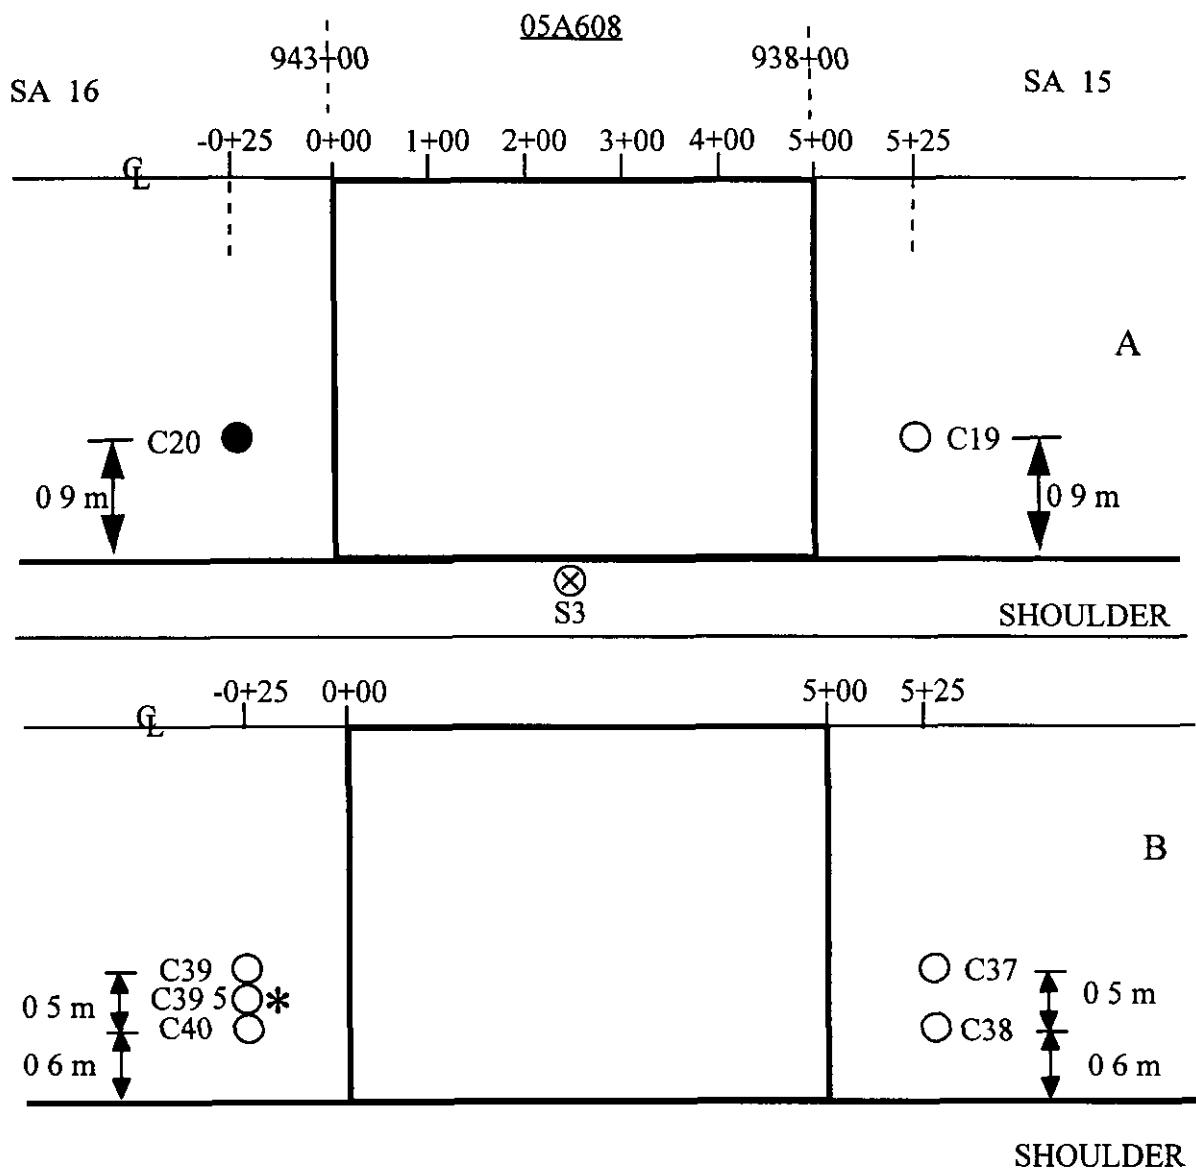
SAMPLING PLAN FOR TEST SECTION 05A606
